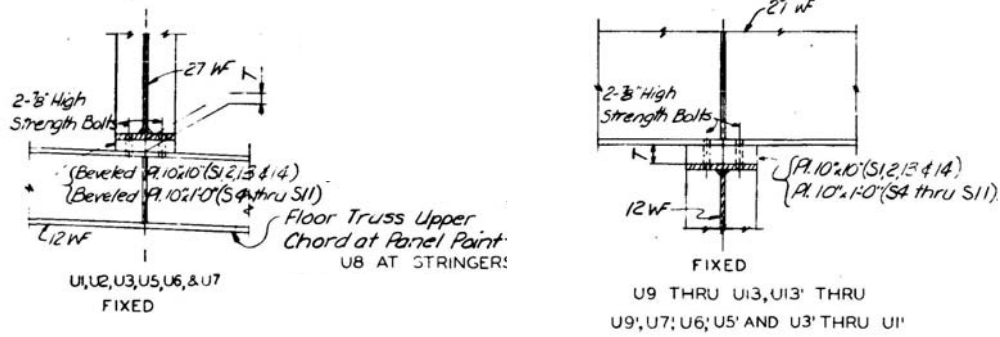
Connection between stringer and upper chord of floor truss (from Mn/DOT 2008).
